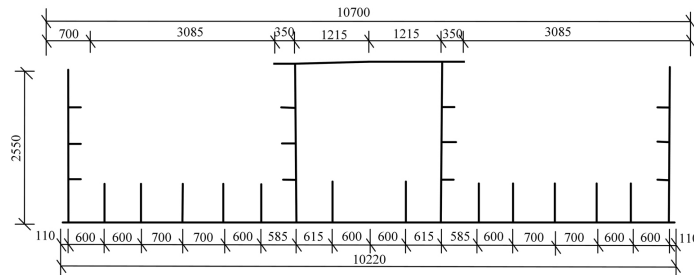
Cross-sectional diagram of the main bridge of Jinzhou Bridge (3) (mm)
